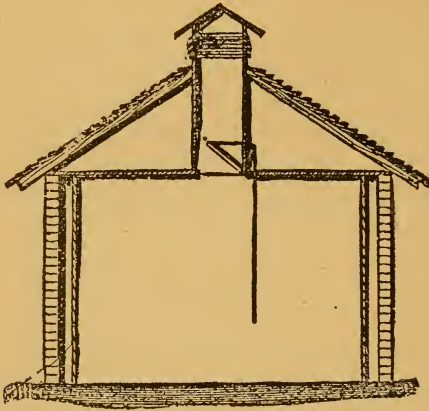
BRICK OR STONE MILK-HOUSE.
